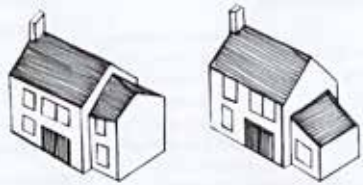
Building displaying a consistent traditional window style and shape across the main elevation.
